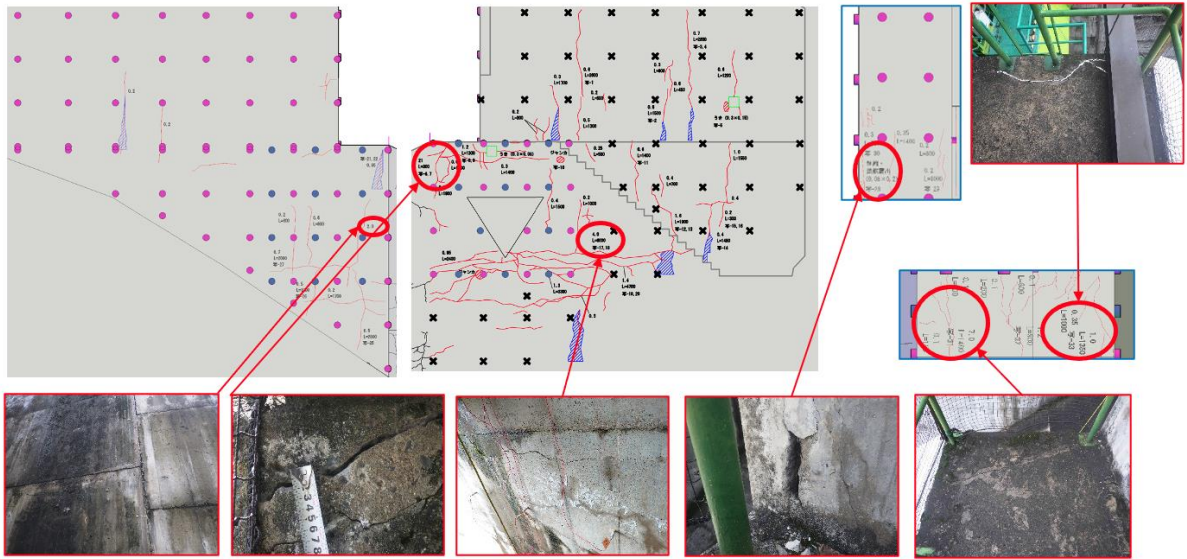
Side wall concrete of orifice gate of Fig. 1b.
